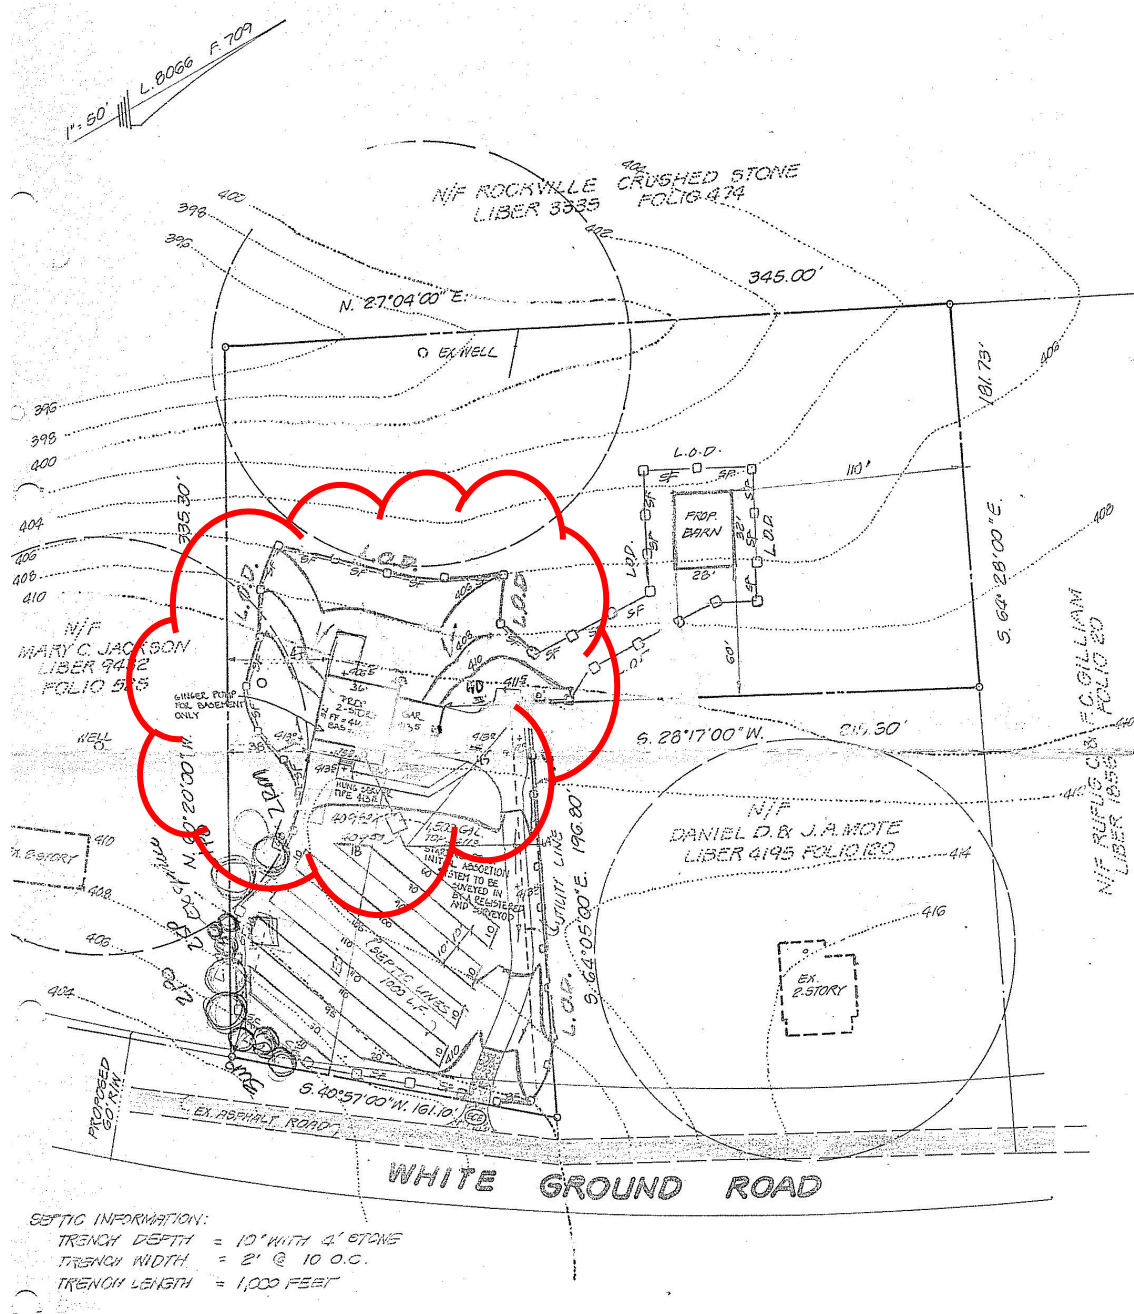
The site plan for HAWP #18/08-02C at 19820 White Ground Road. The proposed house location was set back about 150 feet from White Ground Road and is clouded in red.
